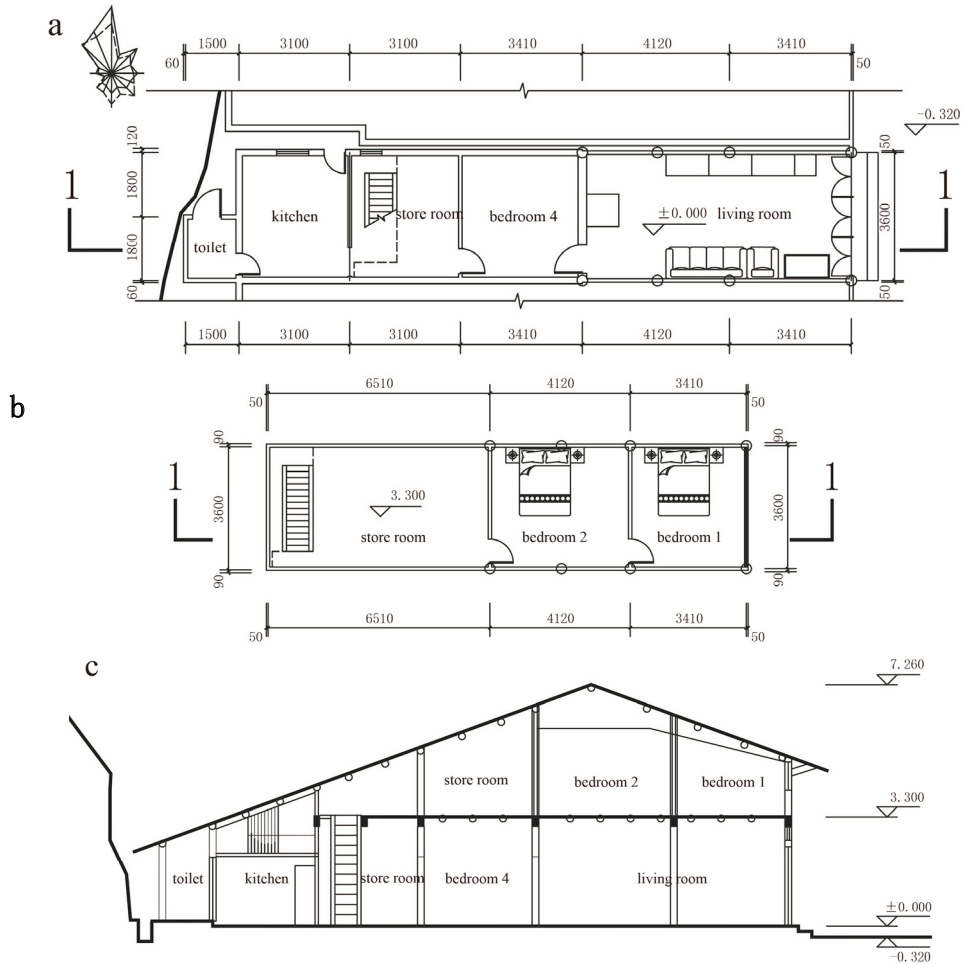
(a) first floor plan; (b) second floor plan; (c) 1-1 sections
